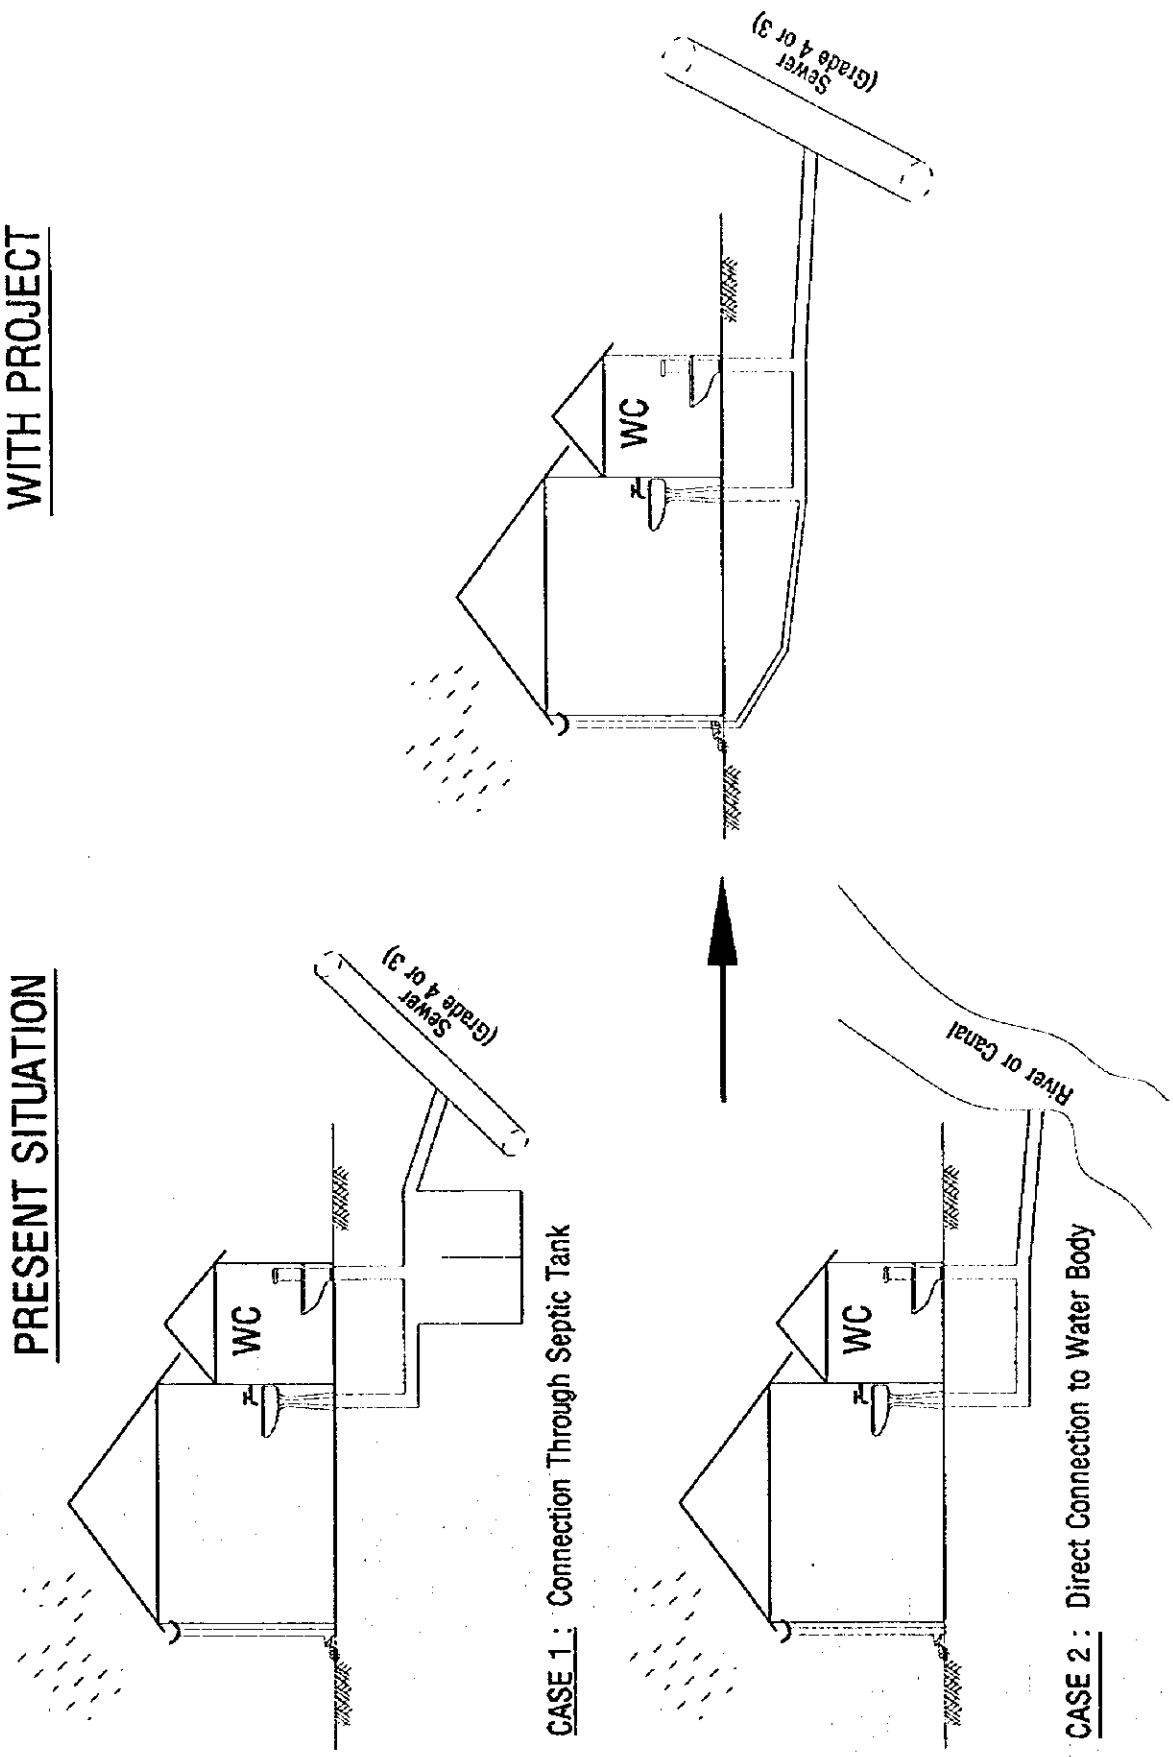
Proposed Sewer Connection from Individual Houses
